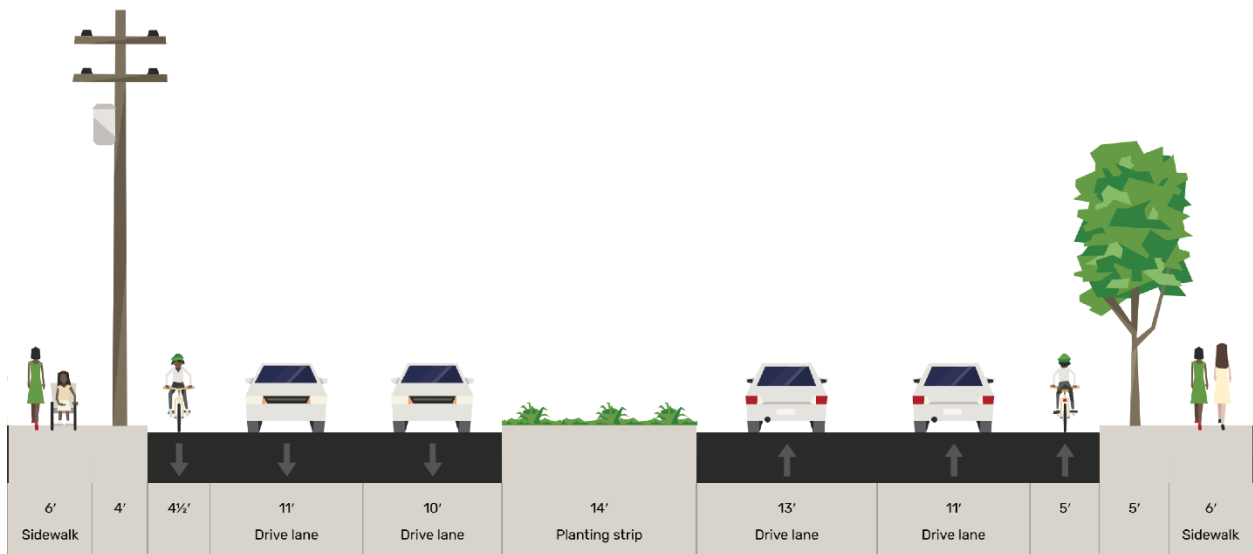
Draft Concept Alt C Typical Cross-section South of Central Expressway
